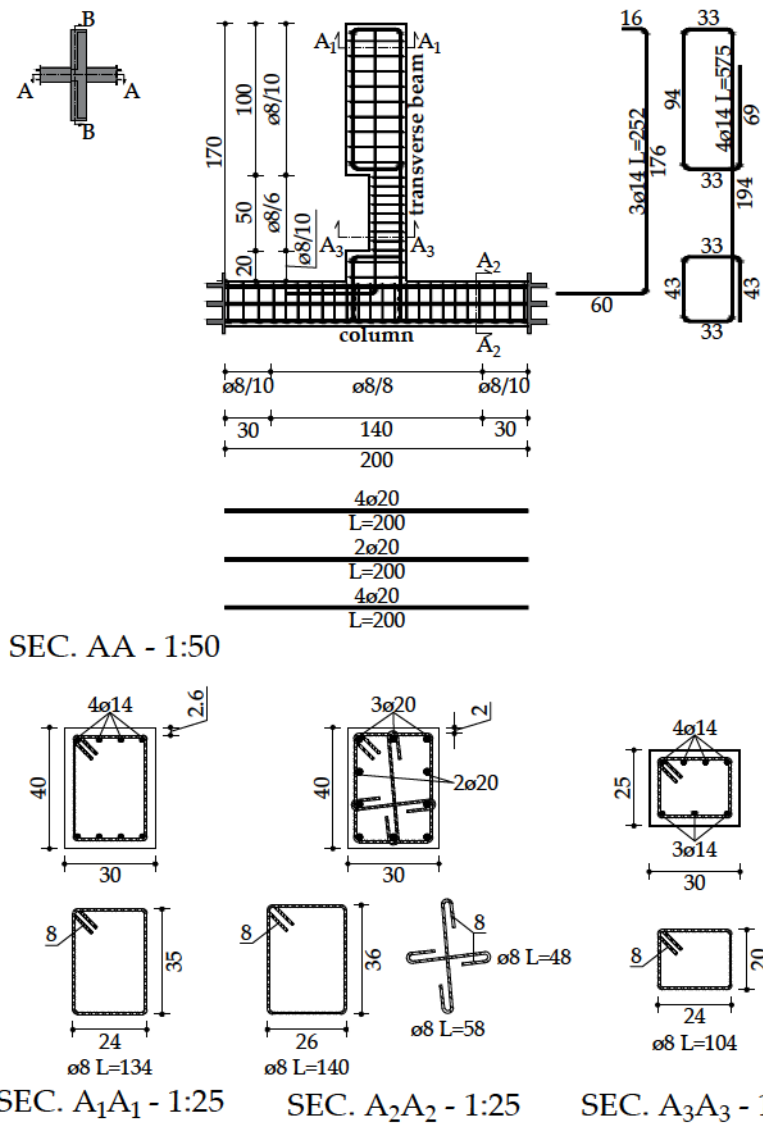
Technical details of the innovative module with the floor deck J_02_S-SEC AA (units:cm).
